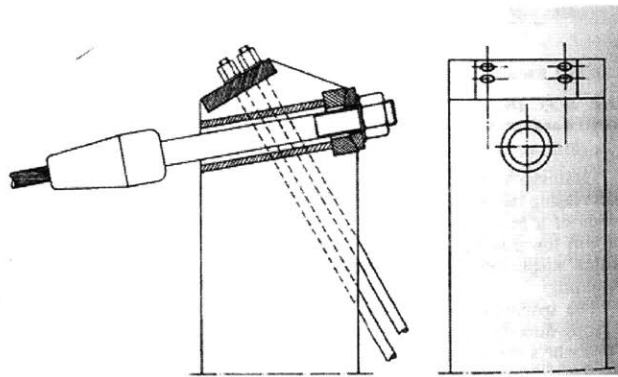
Attachment of cable with socket terminal to top of concrete column.
